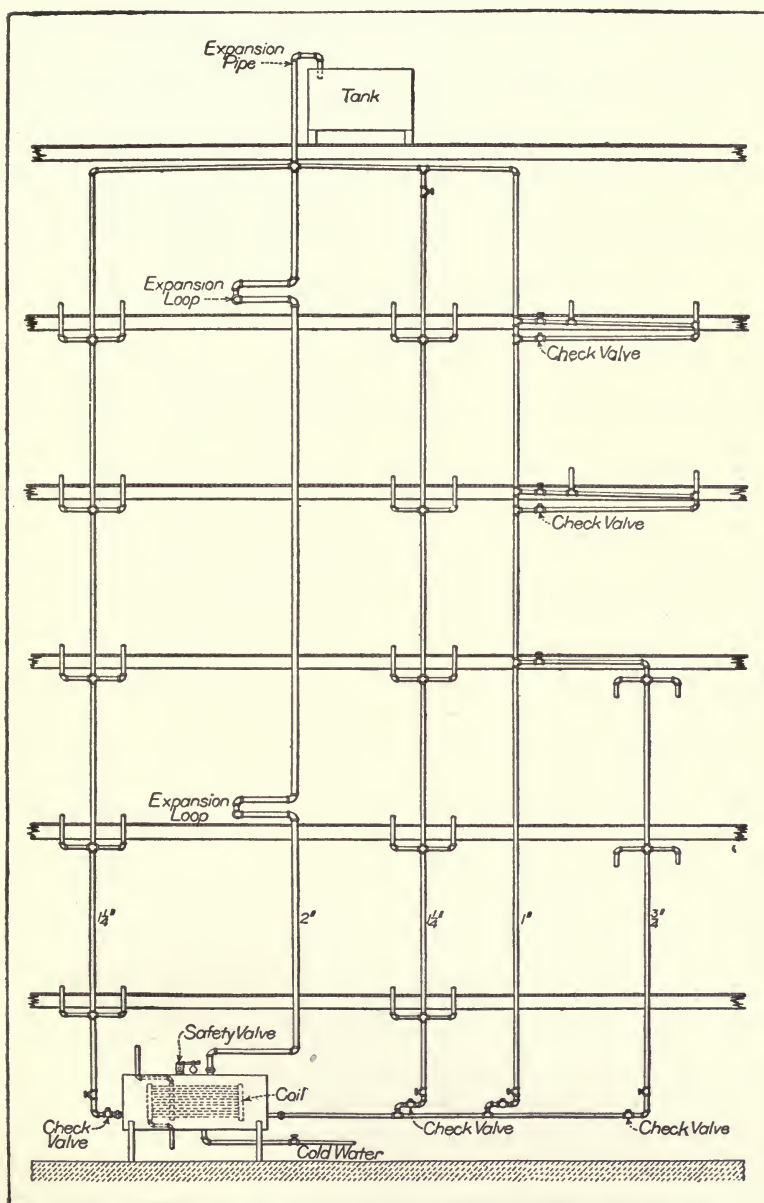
Drop Feed Circulating System in an Office Building or Apartment House.
